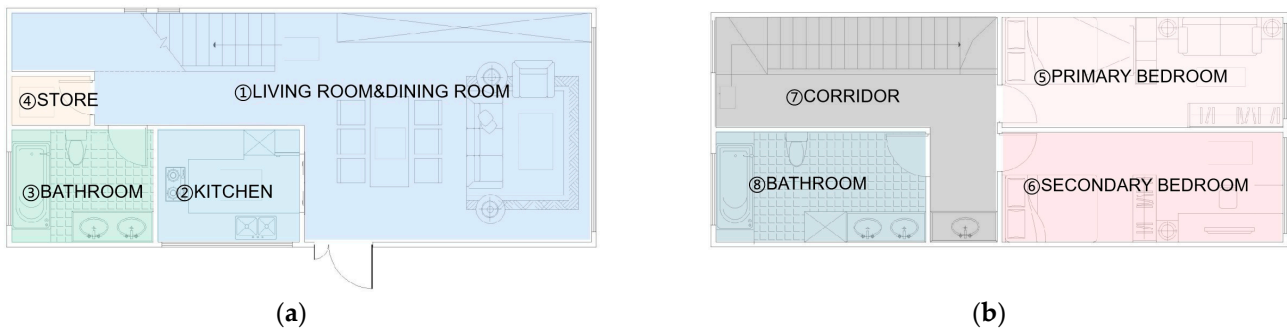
Layout of the modeled container housing prototype for (a) 1st floor; (b) 2nd floor.
